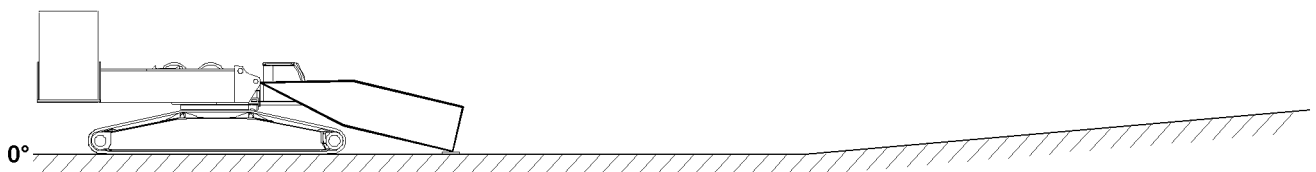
Boom - pivot section installed on turntable and placed on the ground
